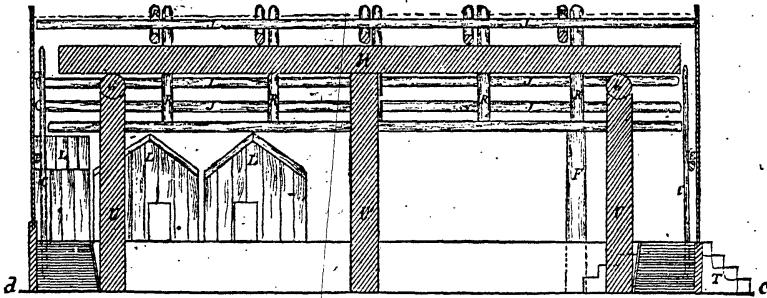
Construction of Kwakiutl house. Longitudinal section, from *c* to *d*.
